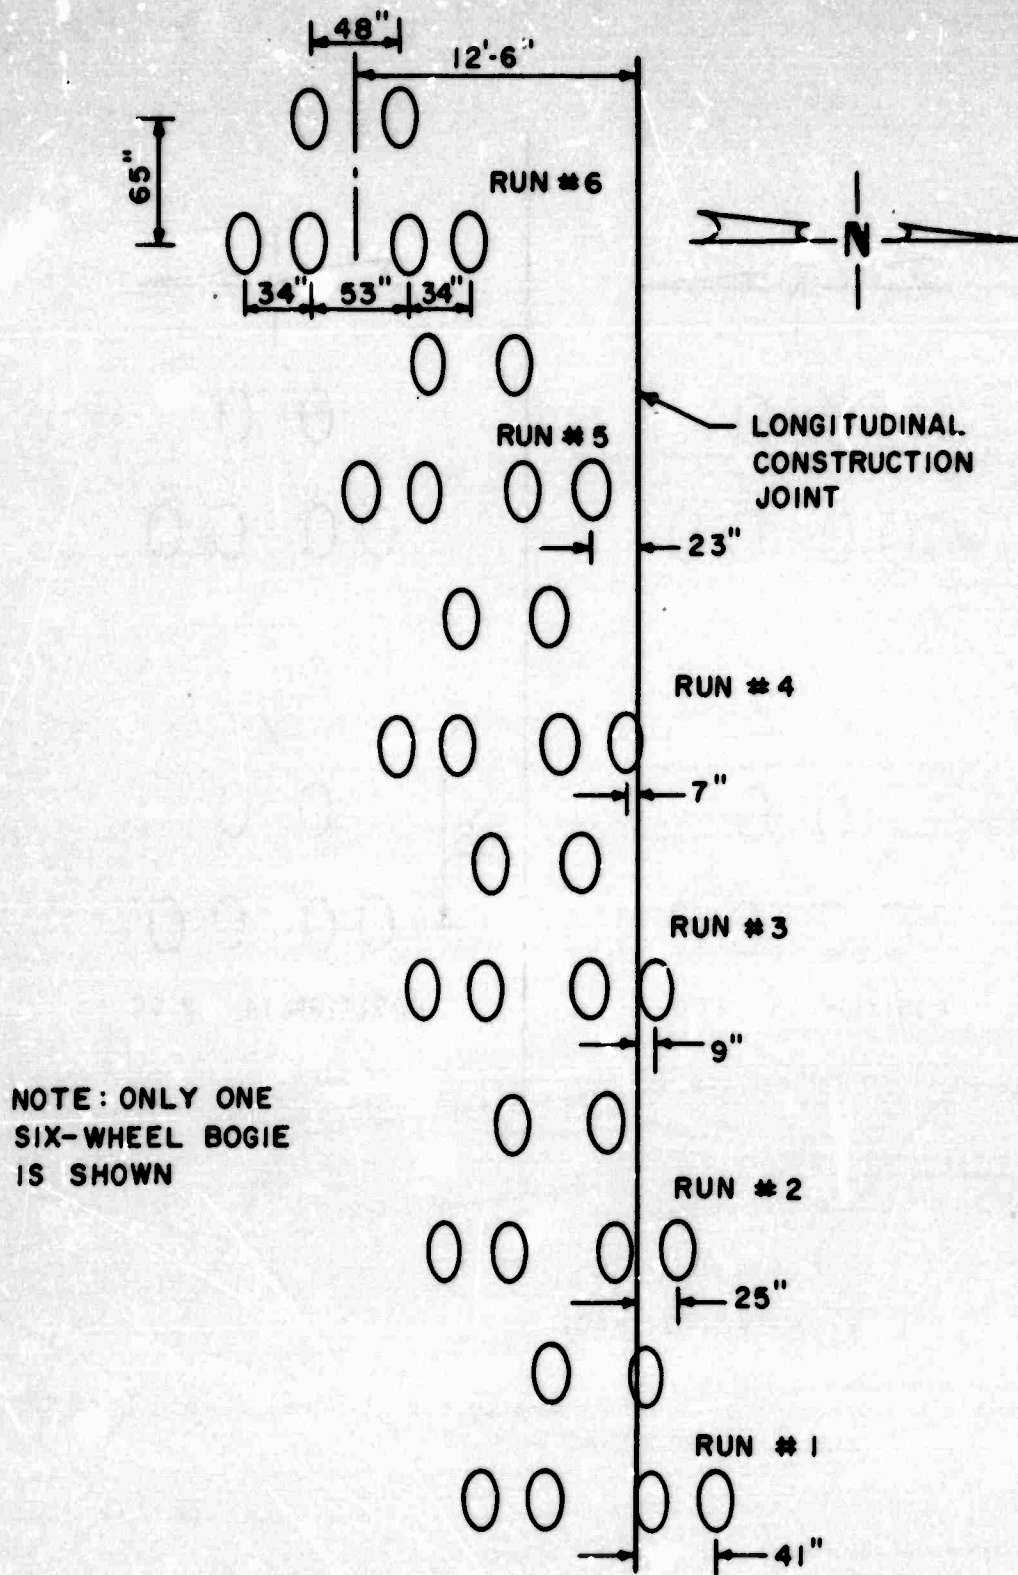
Wheel Positions for 6- and 12-Wheel Dynamic Load Tests on Rigid Pavement Test Section (Wheel Positions Were the Same for Both)
